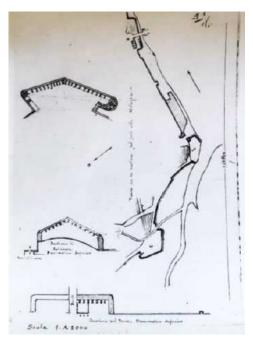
Project drawings of bastioned fortified walls in Pavia (seventeenth century).
